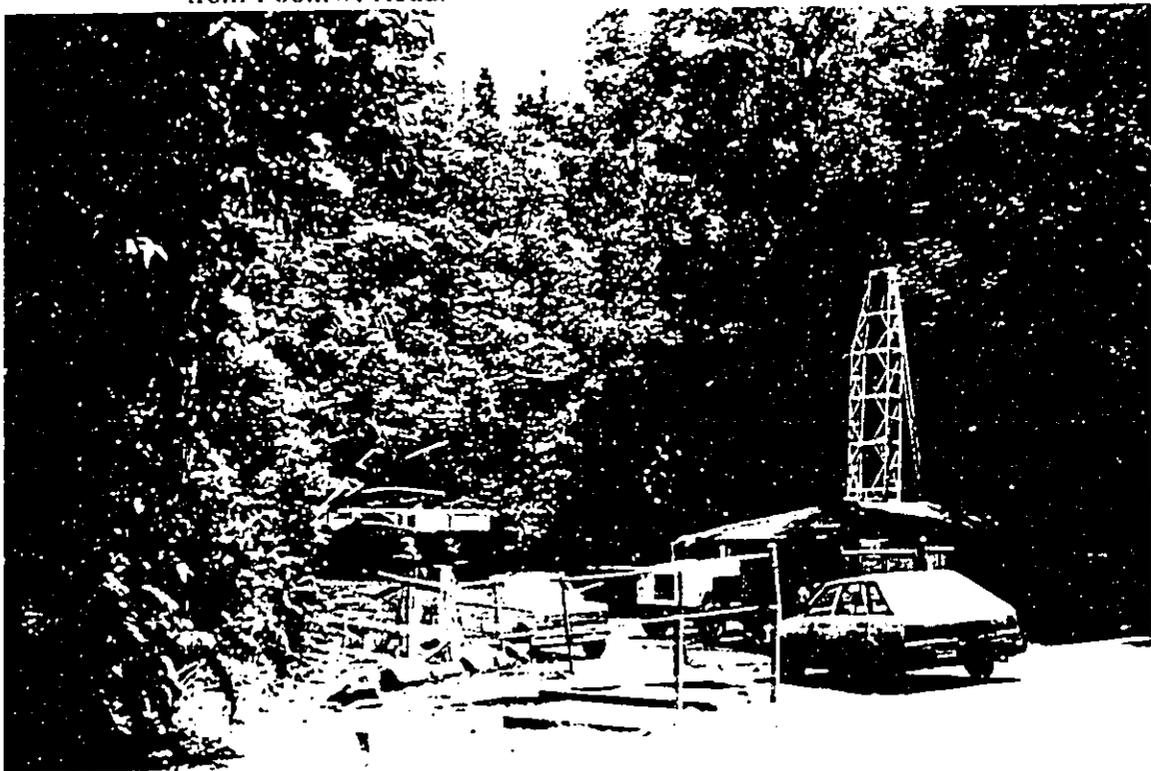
Photograph of Present Kalaheo Well Site at End of Poohiwi Road. View to North-West.
